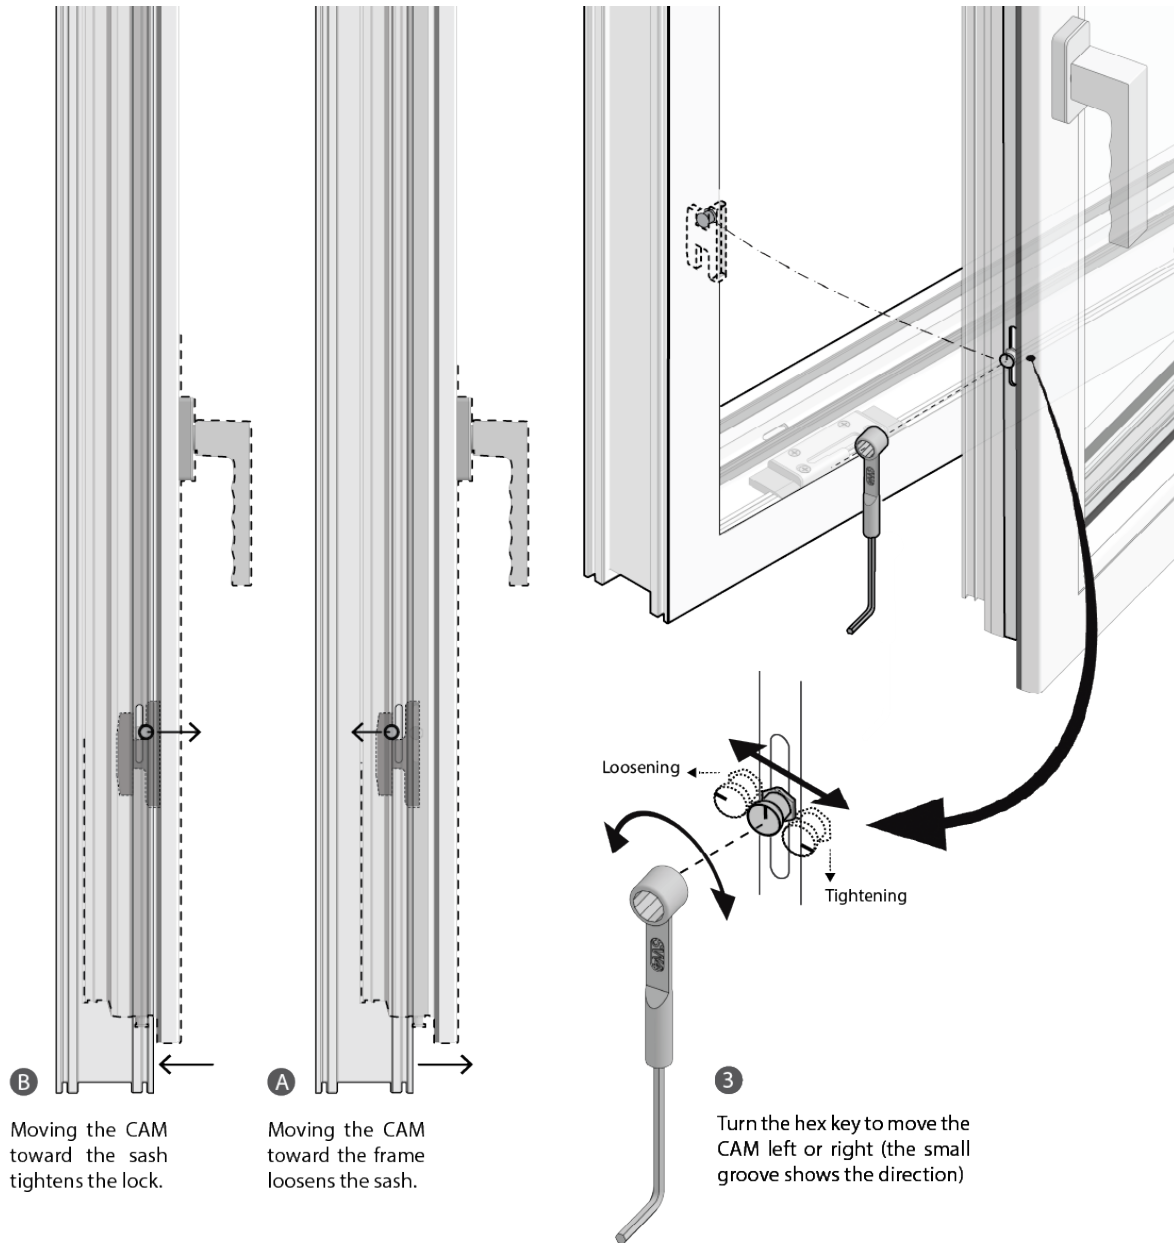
Flat head CAM adjustment. Movement shown is exaggerated for clarity.
